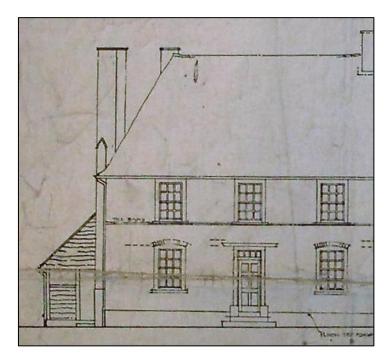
Front elevation design of 115 Willifield Way, 1909 (Hampstead Garden Suburb Trust)
